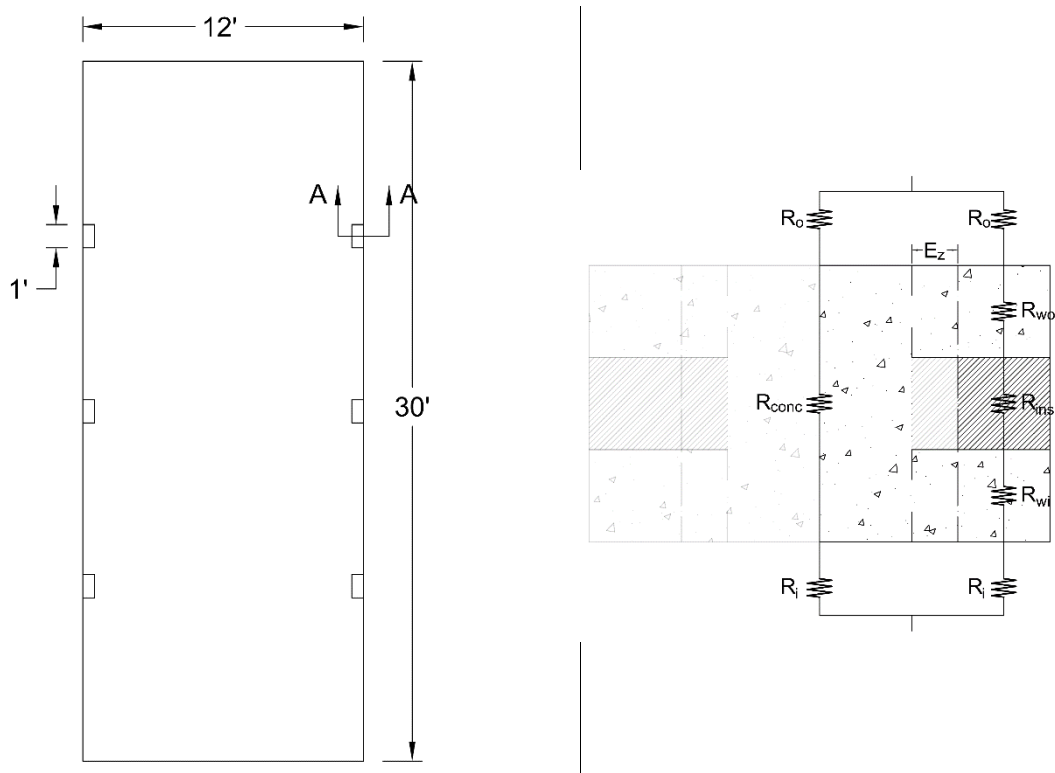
Panel connection example panel layout and cross-section with electrical circuit analogy
